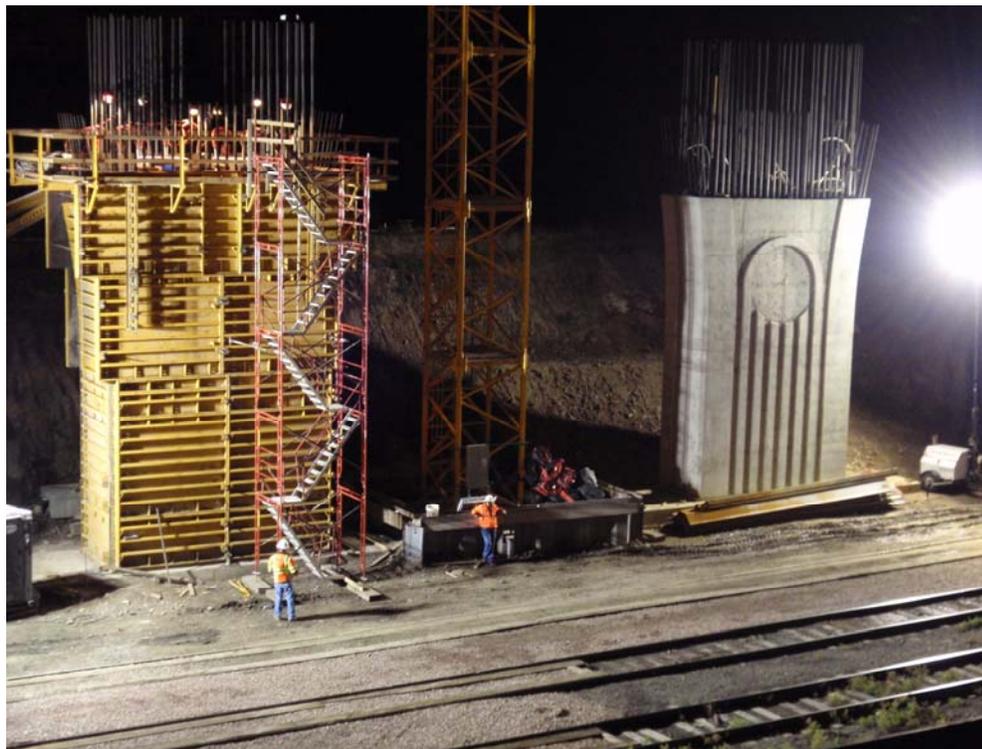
Pier 3 EB Column Construction – August 19, 2008:
